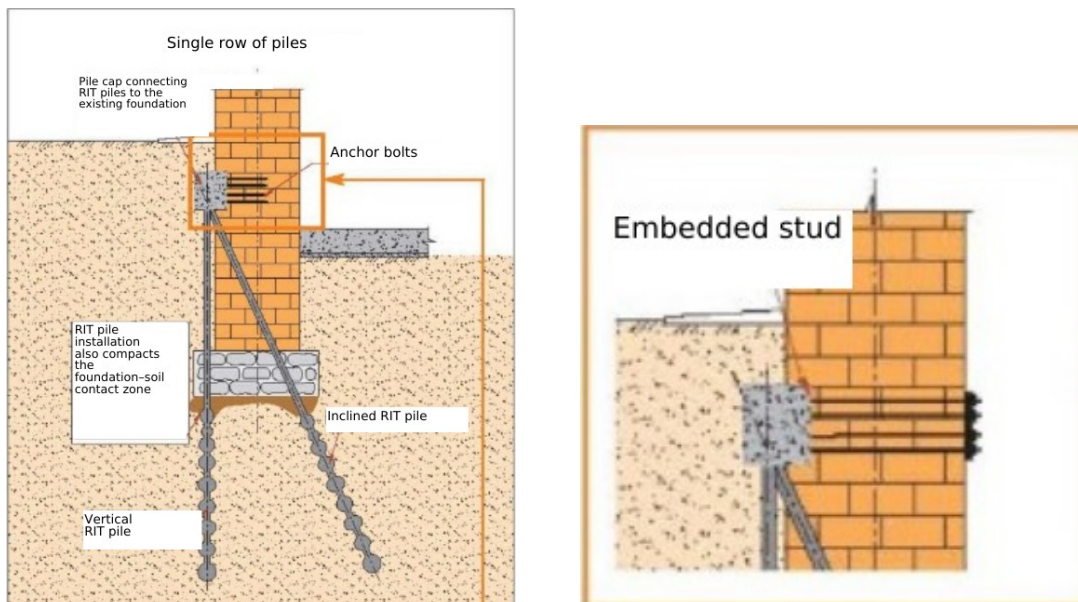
With access from one side and high vertical loads, vertical and inclined piles are connected by a pile cap tied to the building wall.
